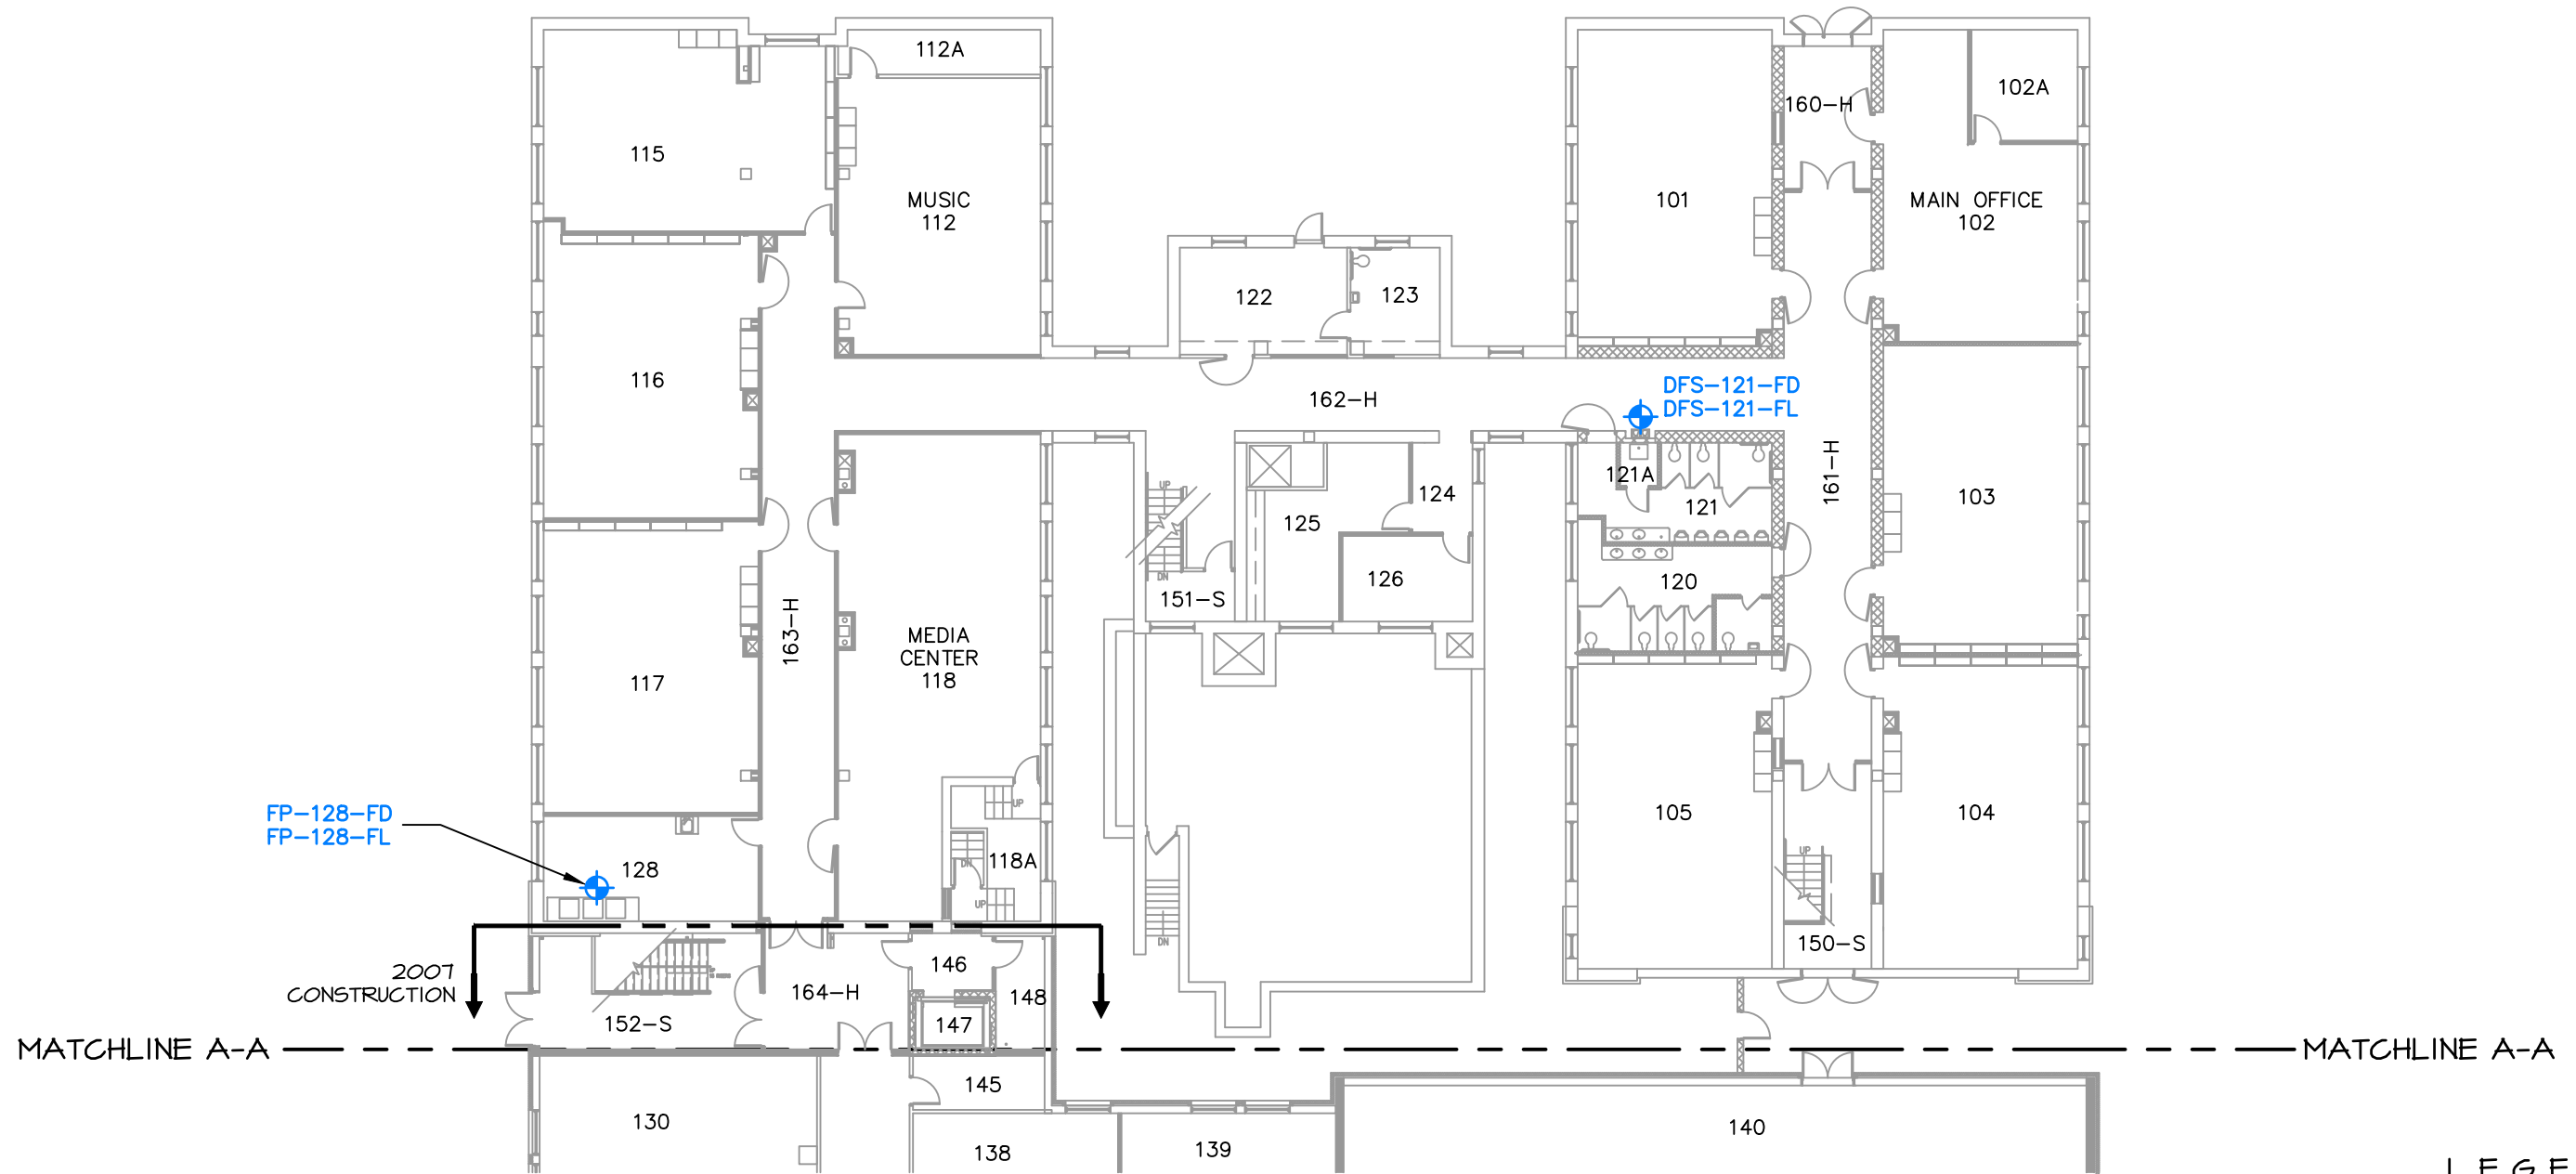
First Floor Plan South Half – Sample Locations – May 22, 2016
